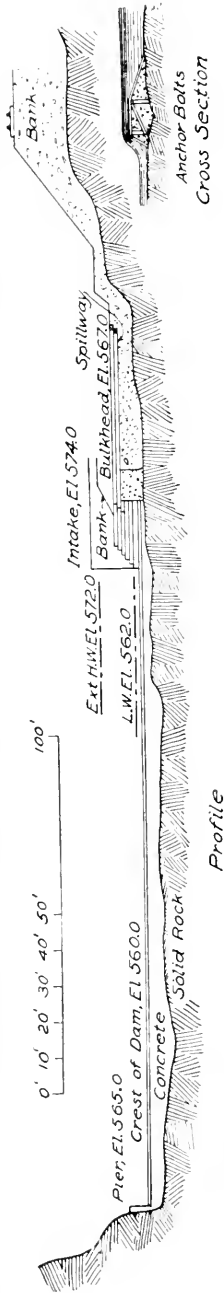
Section Showing Submerged Dam of the Water-Power Plant of the Shoquahmie Falls Power Company, Washington.
